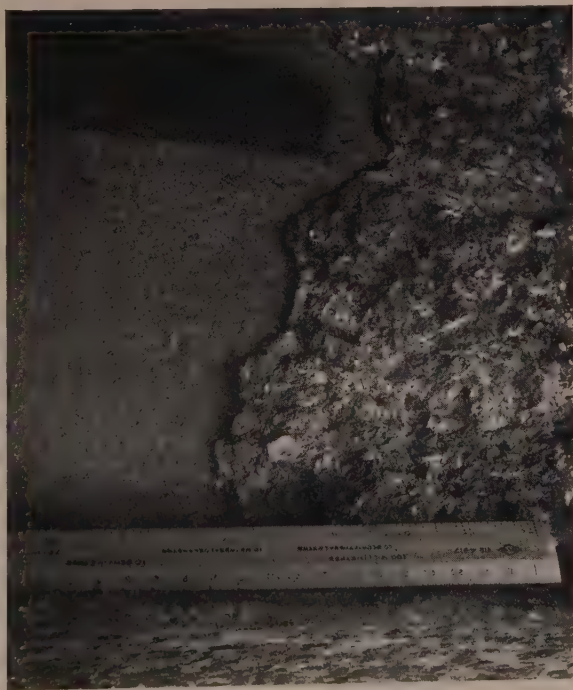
A CLOSE VIEW OF A STEEL JOIST IN A CONCRETE JACK-ARCH FLOOR. THE COMPARISON BETWEEN THE ATMOSPHERIC CORROSION ON THE UNDERSIDE OF THE FLANGE AND THE SURFACE CONDITION OF THE WEB IN CONTACT WITH THE CONCRETING IS INTERESTING. DATE OF THIS CONCRETE IS BEFORE 1910
